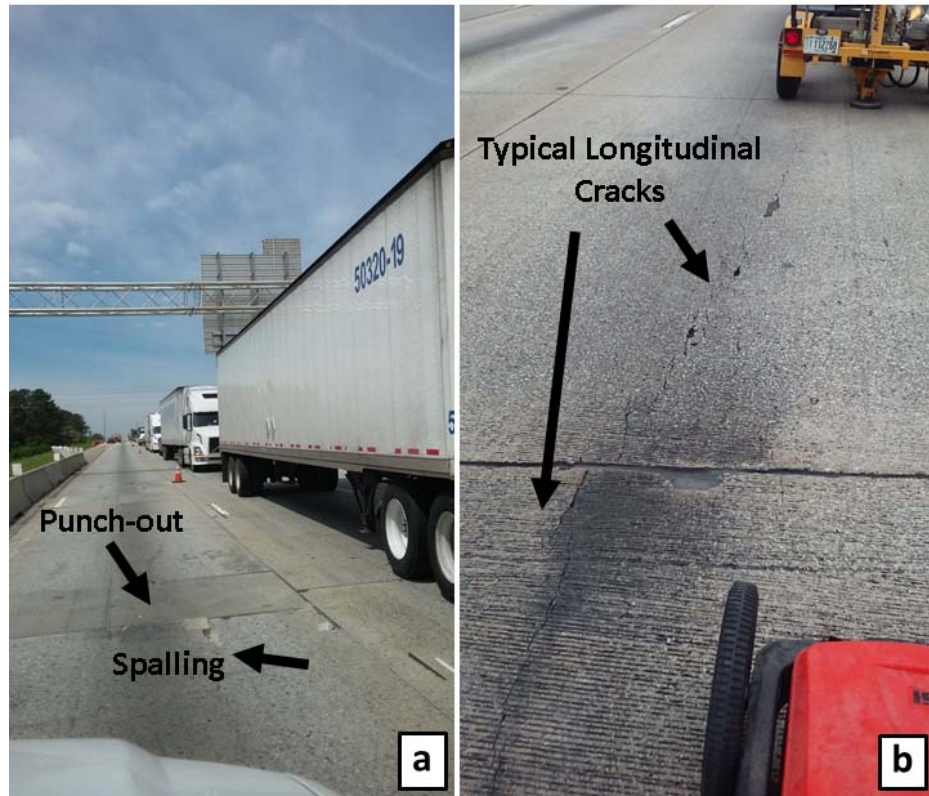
I-75 Typical Distress (Poor Condition)
